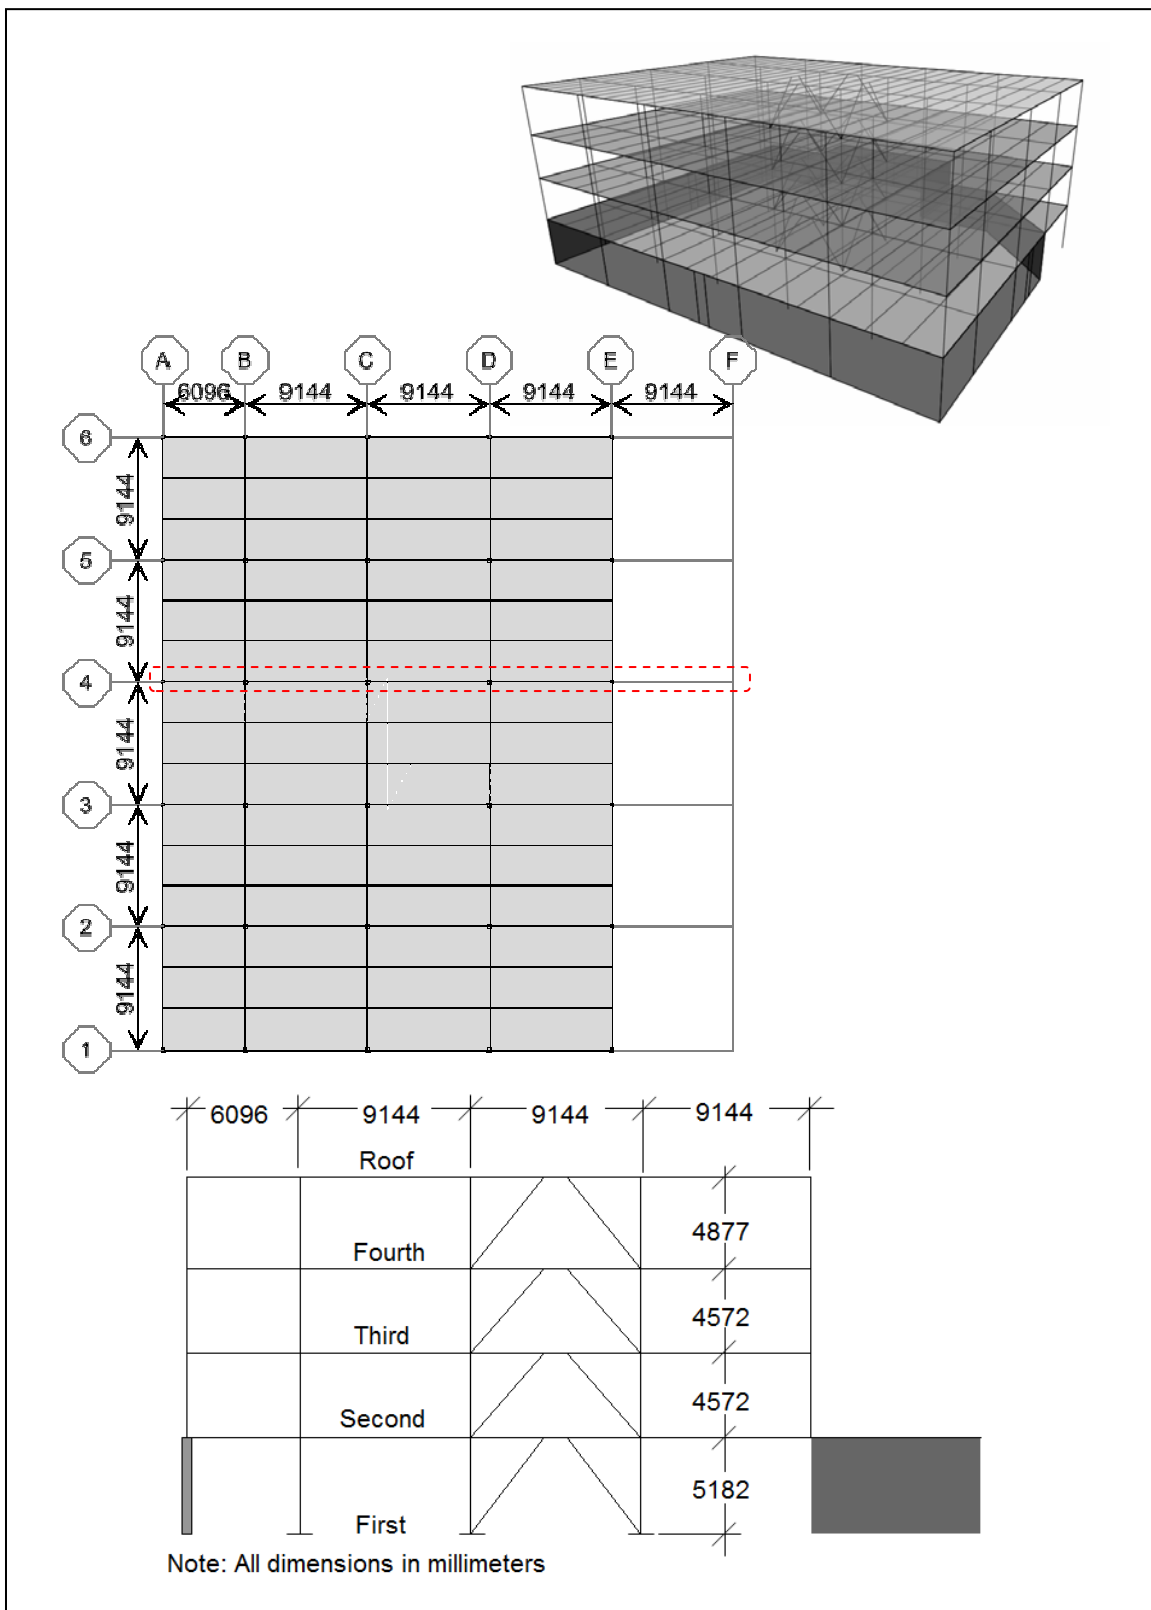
Building EBF-1 3D, Plan and Section at Gridline 4
